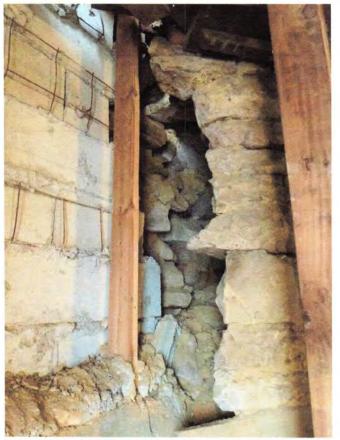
Separation between the exterior wall (left in image) and the chimney mass is evident at the first floor, north room.
